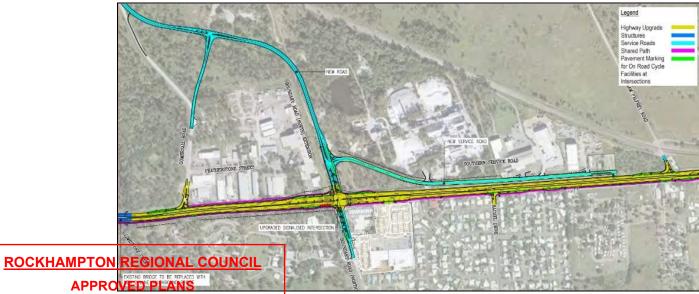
RNAU Concept Plan – Yaamba Road Section (Modified from www.tmr.qld.gov.au)
